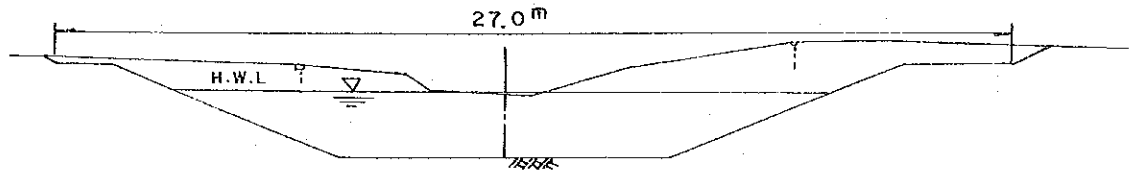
(4/5). PROPOSED CROSS SECTION OF ITAY RIVER FOR MASTER PLAN
